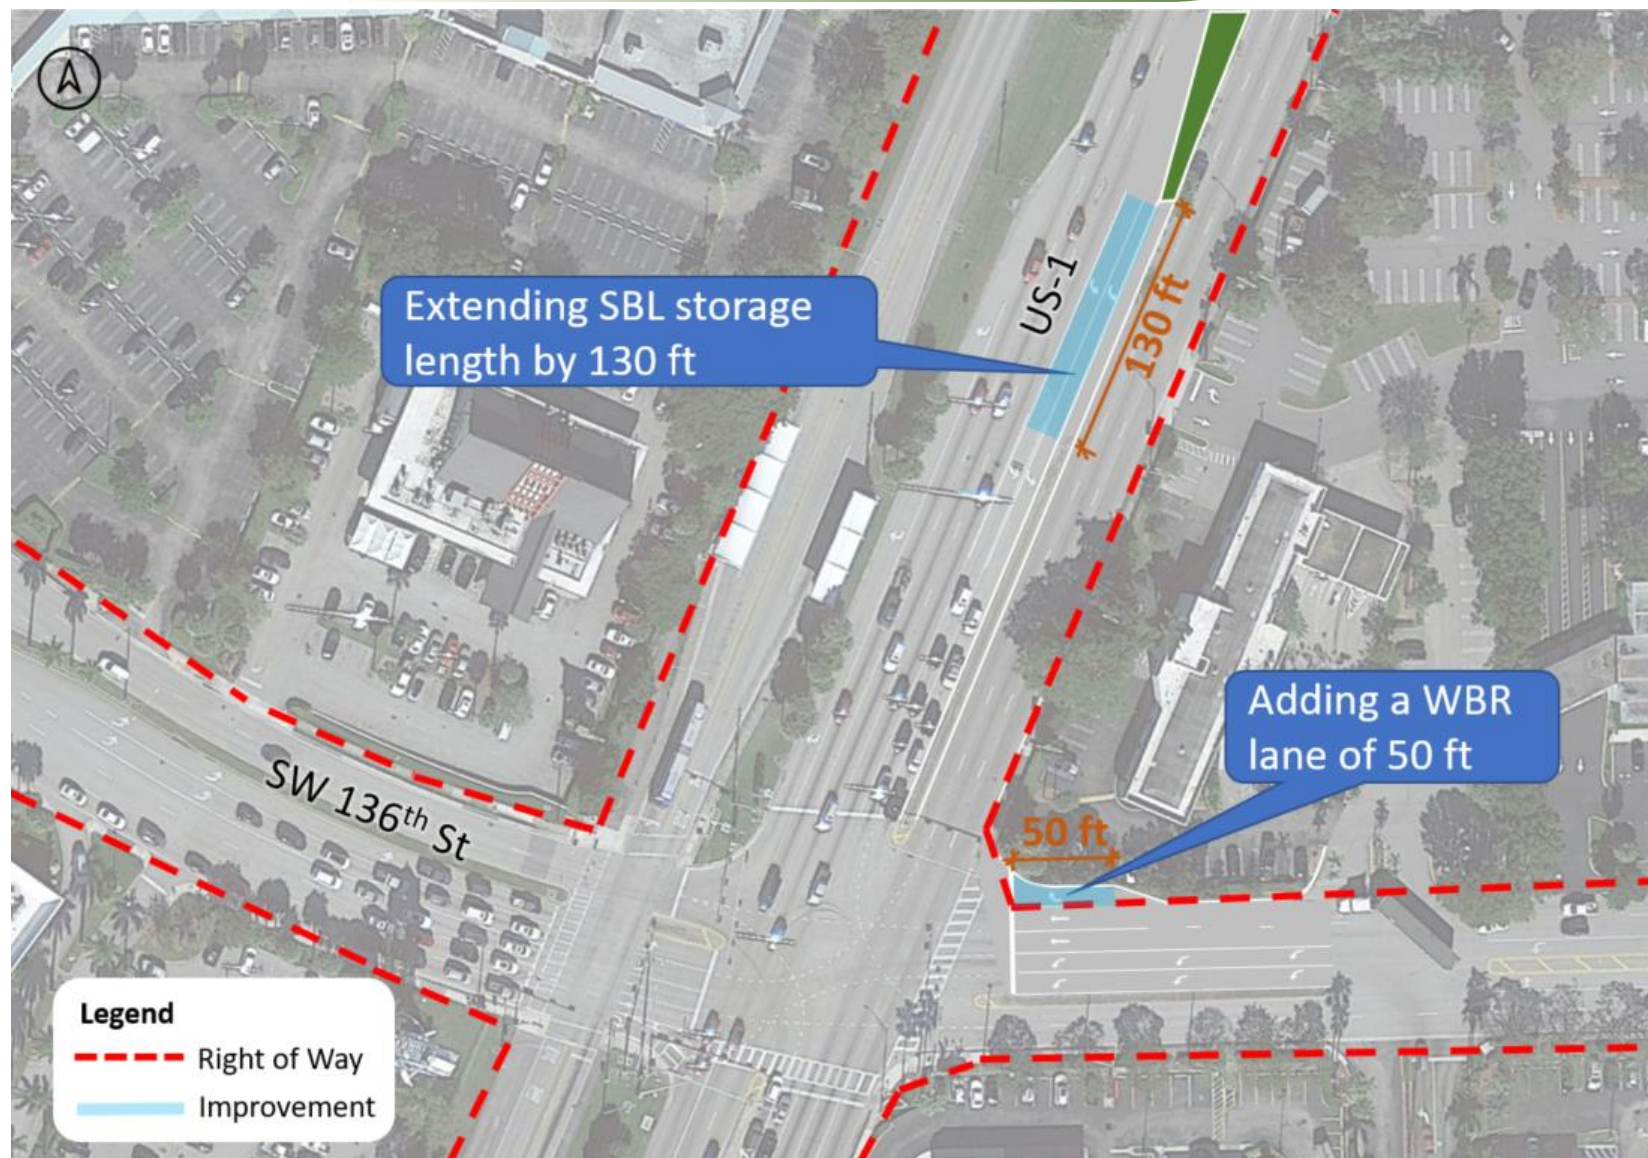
Conceptual Design Plan – US-1 and SW 136th Street
